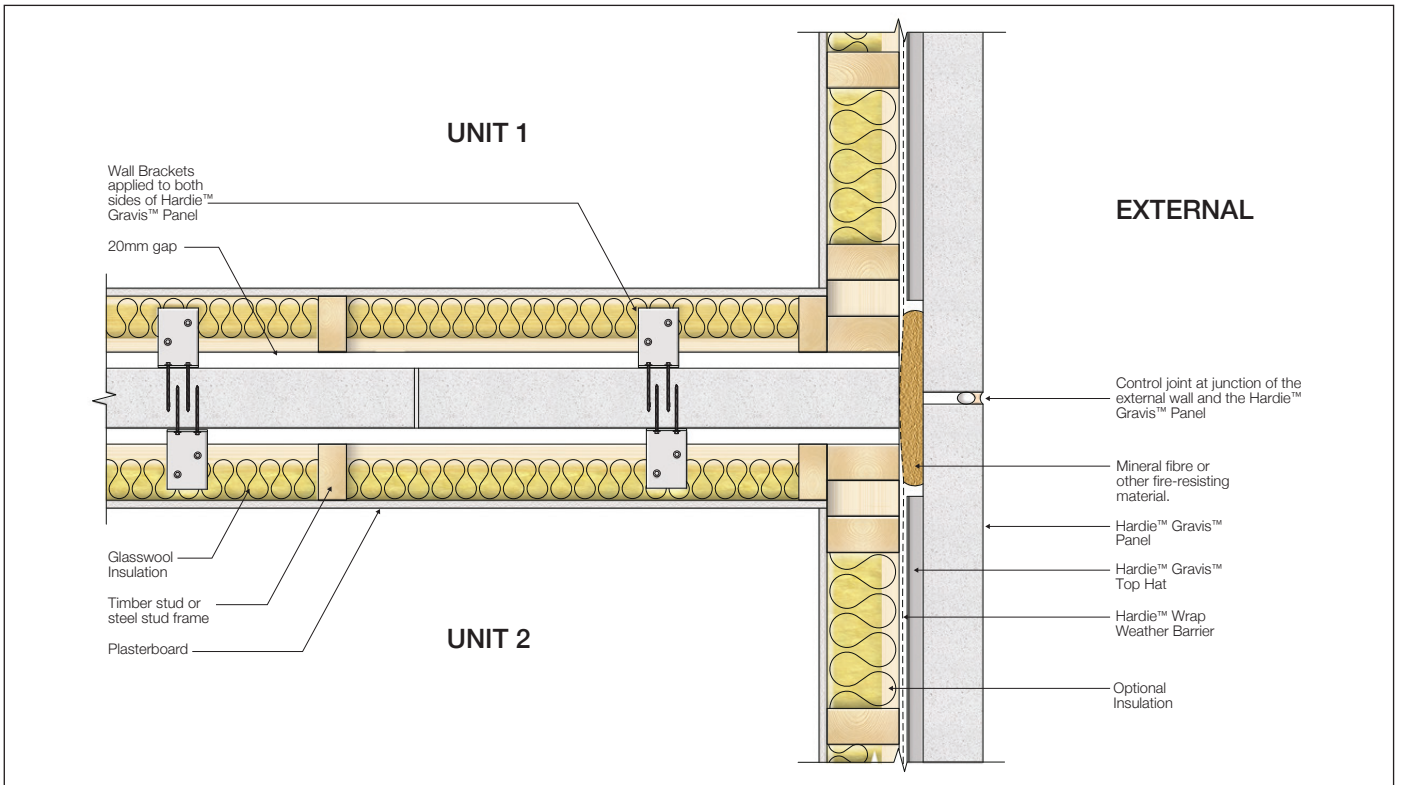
EXTERNAL WALL JUNCTION FOR VERTICALLY ALIGNED INTERTENANCY DISCONTINUOUS WALL SYSTEM
